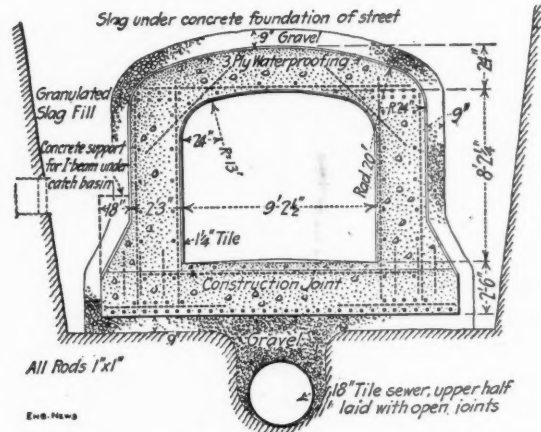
CROSS SECTION OF PASSENGER SUBWAY
